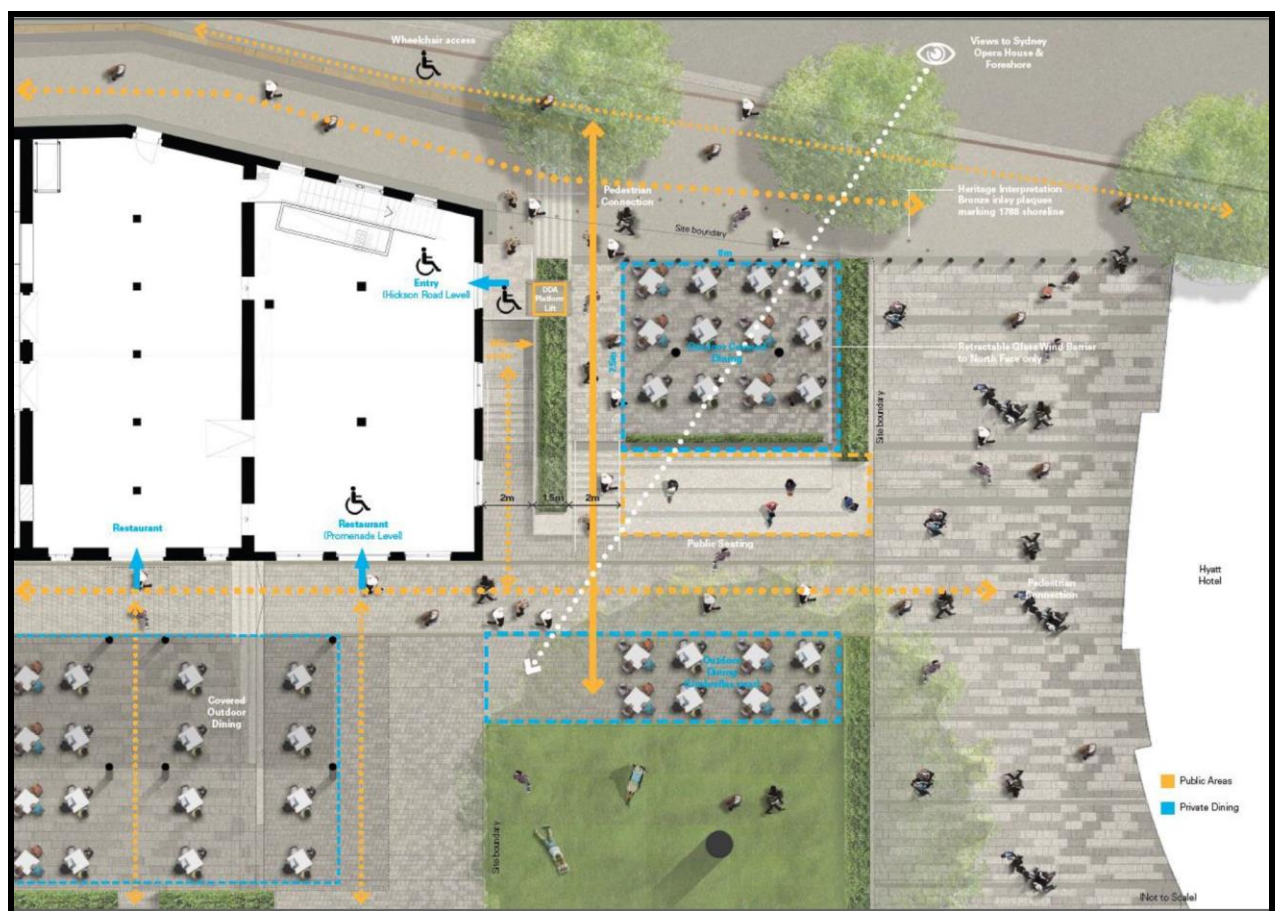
Extract of Bay 12 Site Plan (Figure 1, Pg. 5, SSD 7056: Response to Submissions, Urbis)
